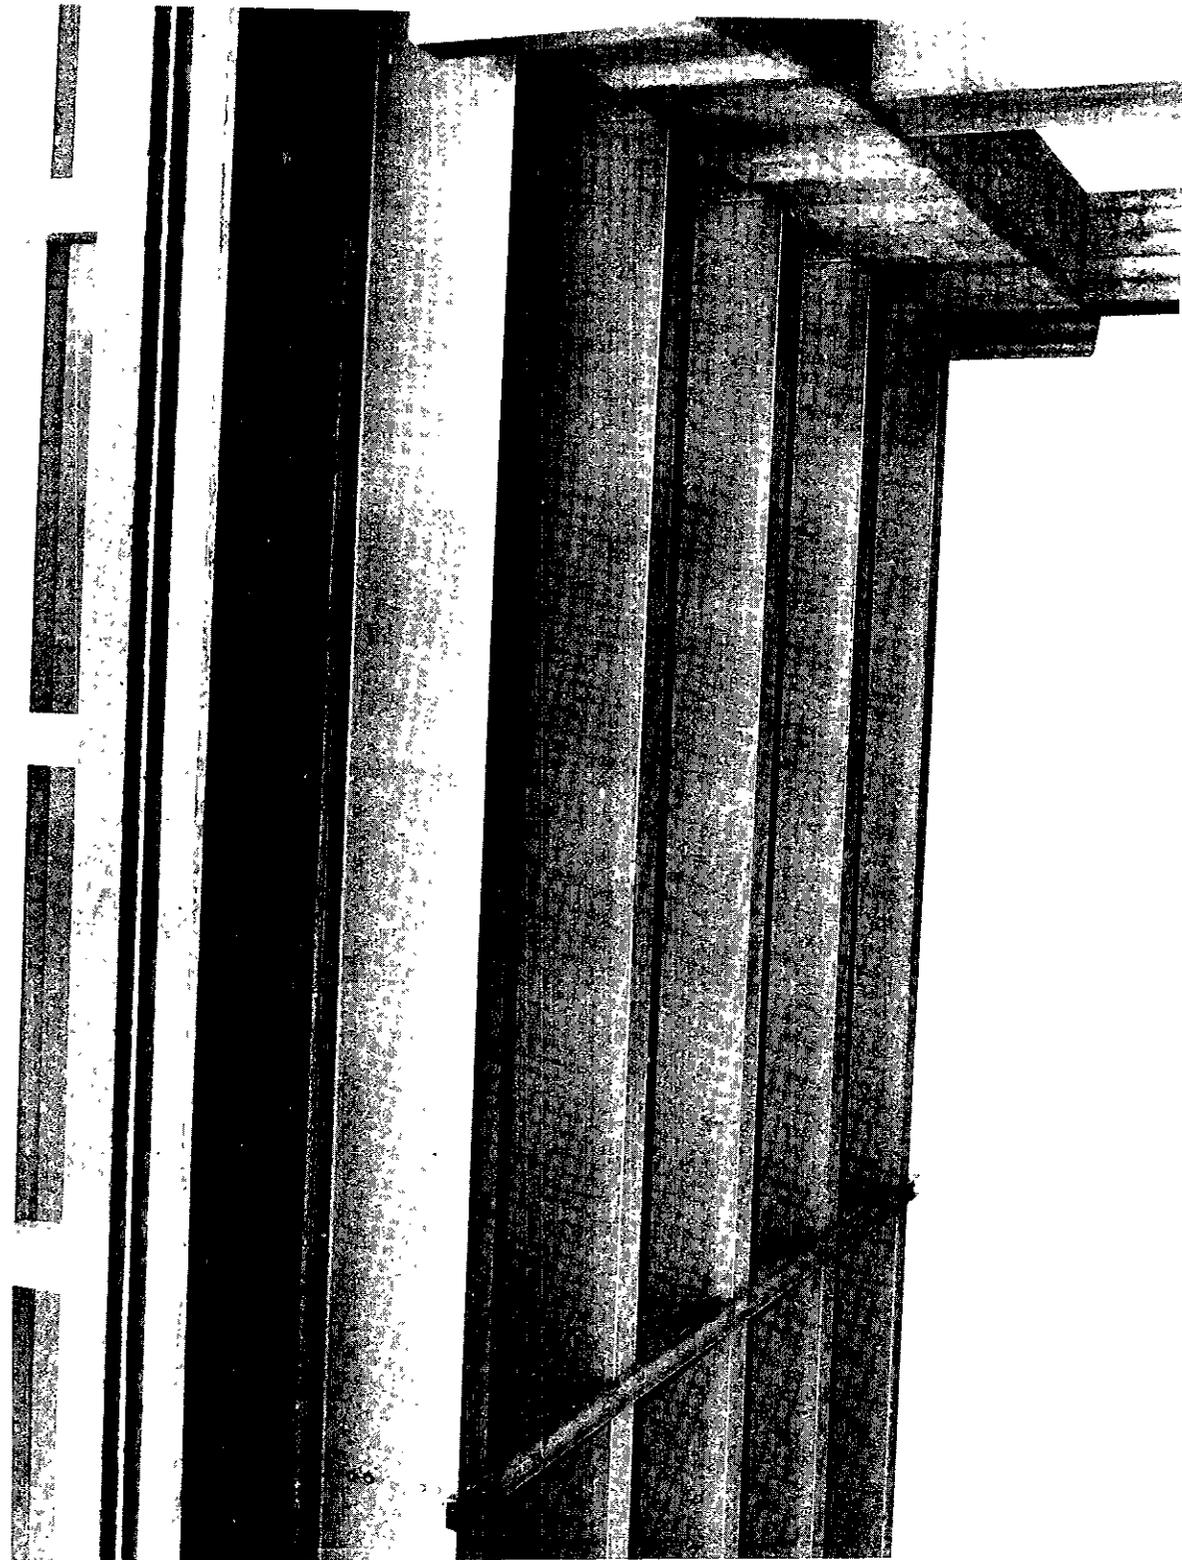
Leffingwell Creek Bridge. Span 5, North Section
